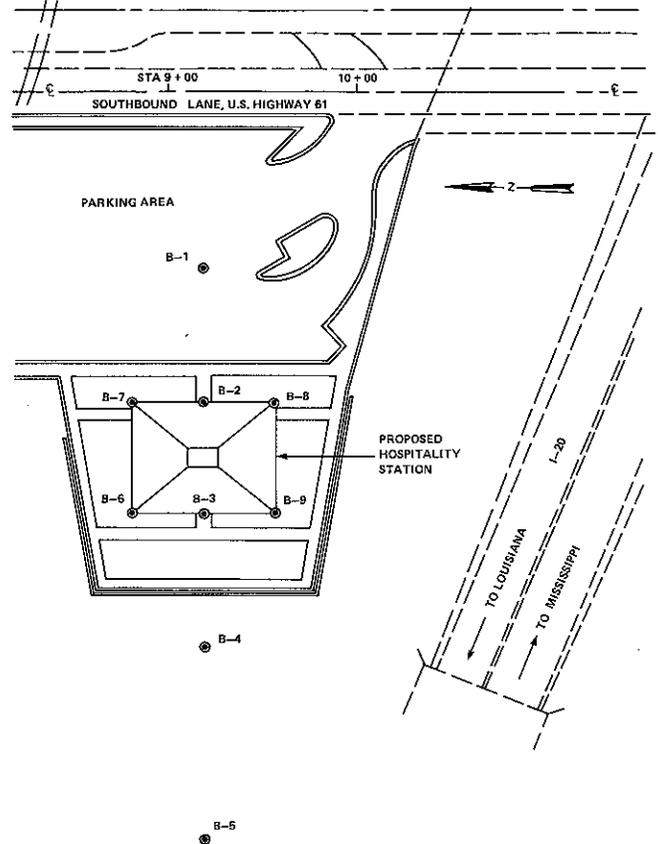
Plan and Boring Locations of the Stone Column at Vicksburg, Mississippi
